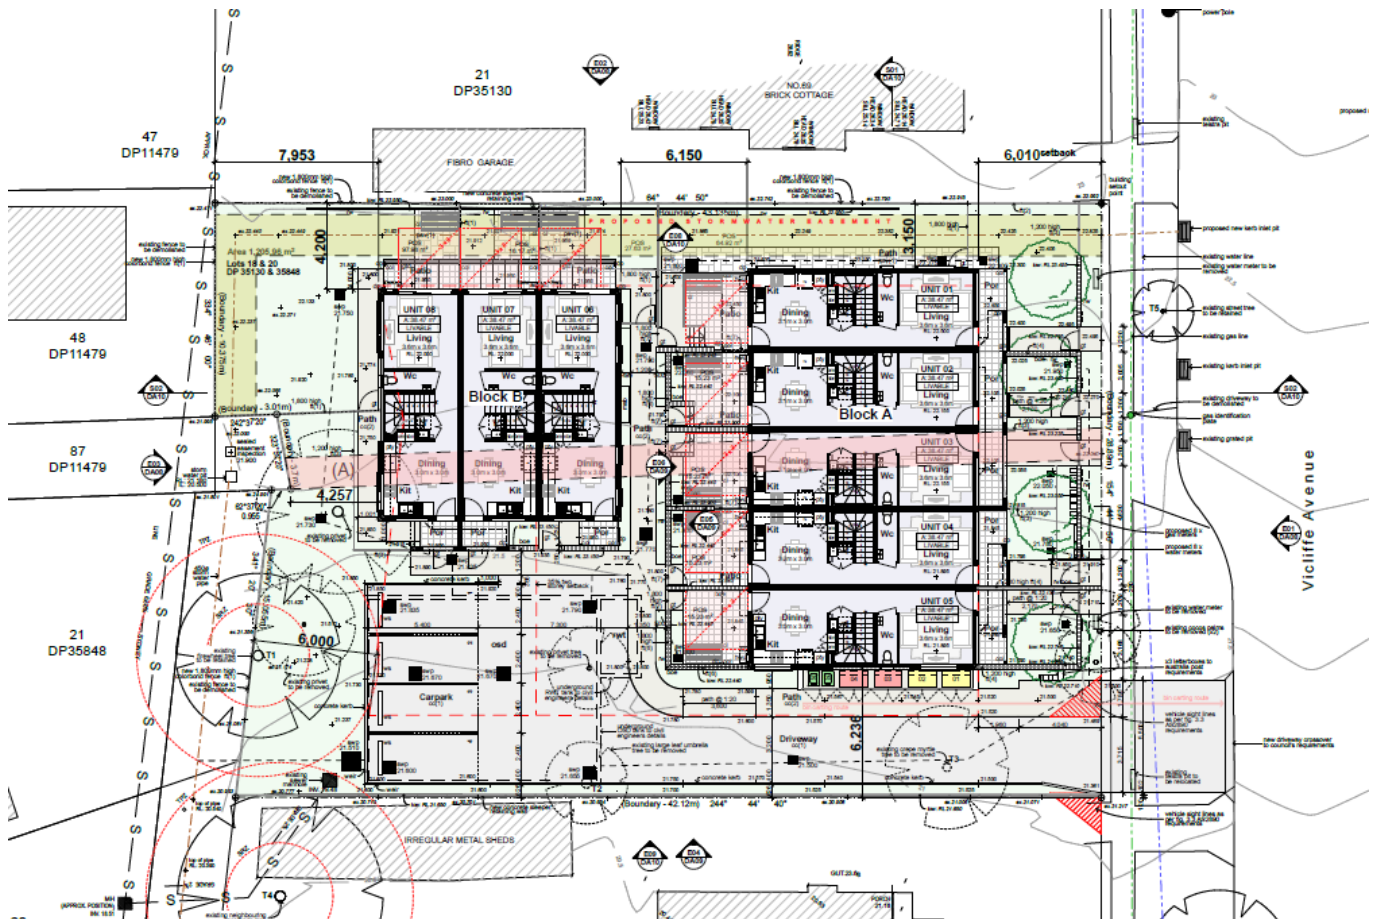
Extract from Architectural Plans – Site and External Works Plan (Source: Stanton Dahl Architects, dated 27/01/2023)
